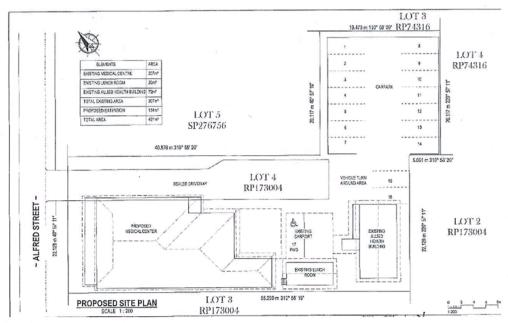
Submitters house located on of proposed site plan. Note absence of setback dimensions on proposed plan.
